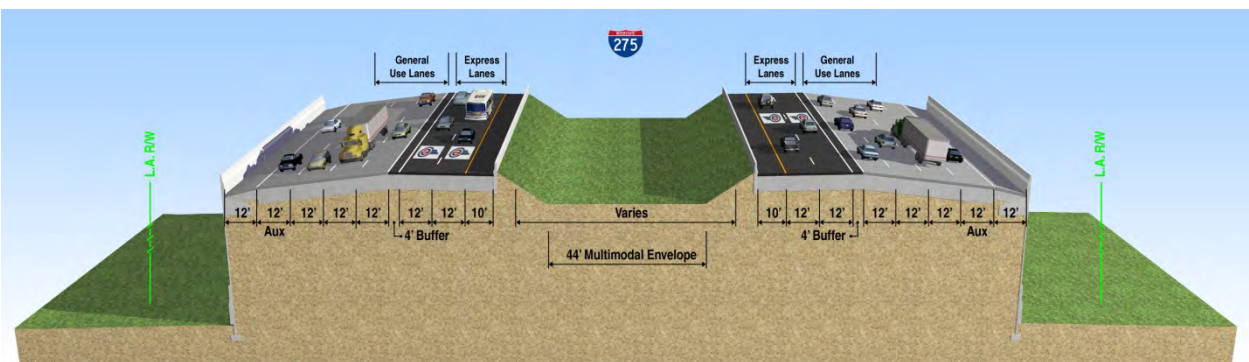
I-275 EXPRESS LANES TYPICAL SECTION FROM SOUTH OF LOIS AVENUE TO HILLSBOROUGH RIVER BRIDGE FPID 434045-2
